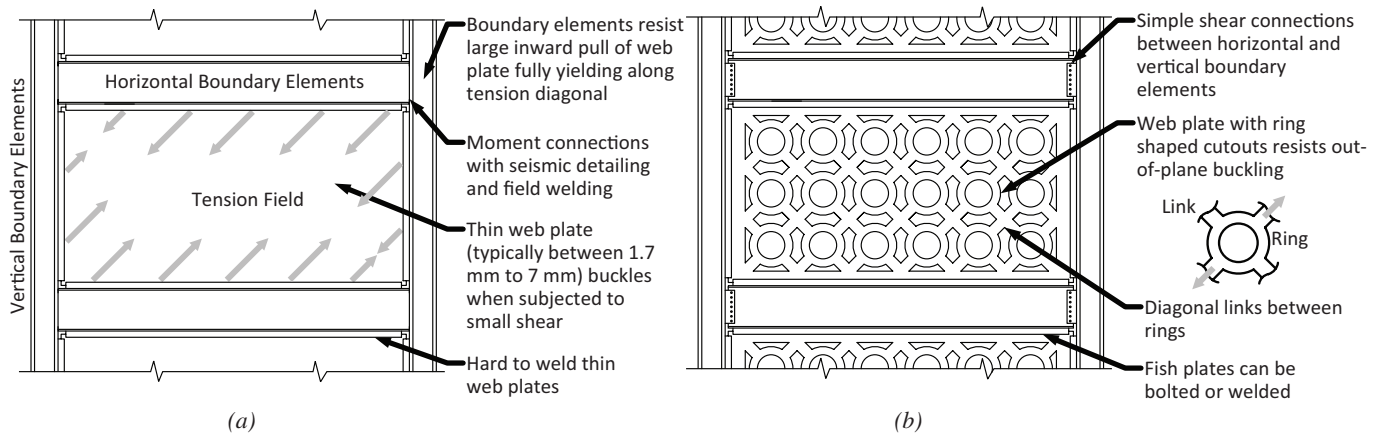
(a) Conventional steel plate shear wall (SPSW); (b) ring-shaped steel plate shear wall (RS-SPSW).
